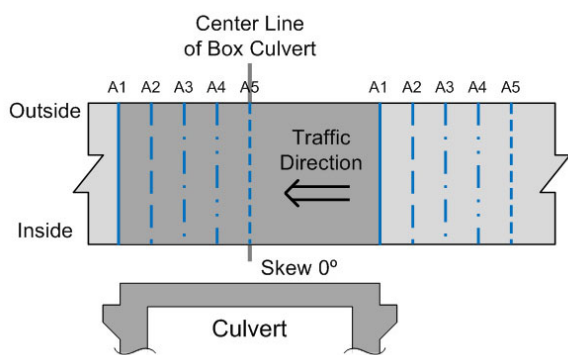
Joint Positions in Slab over 0° Skewed Box Culvert
